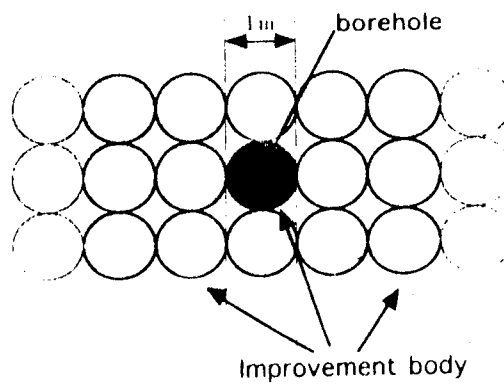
Field arrangement of the test area (Imamura et al., 1996).
